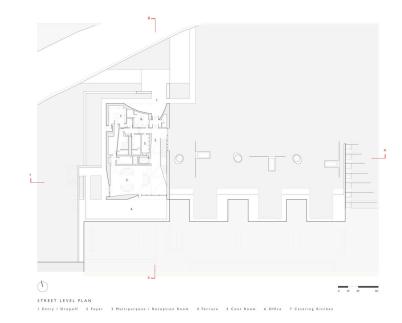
| LAKEWOOD FLOOR PLAN | HGA ARCHITECTS
